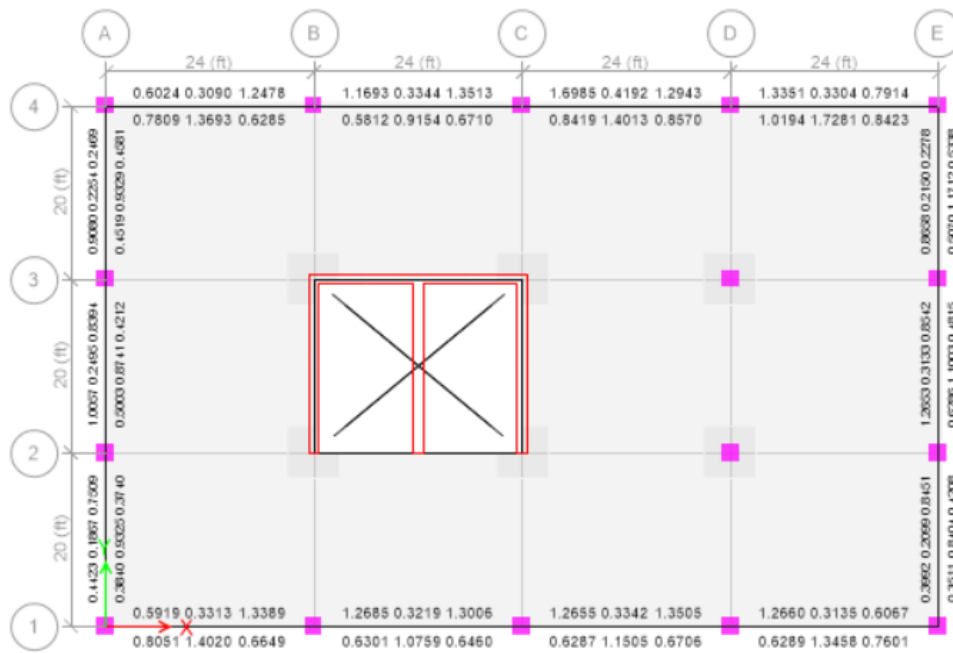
Design information for longitudinal reinforcement in the parameter beam on the 6th story plan.
